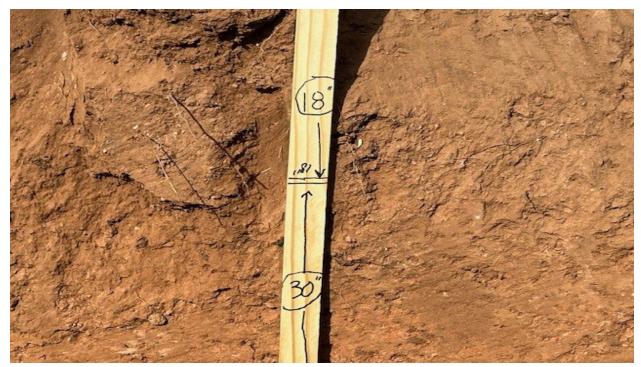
Close up view of Trench 6 soil profile from approximately 12 to about 24 inches
